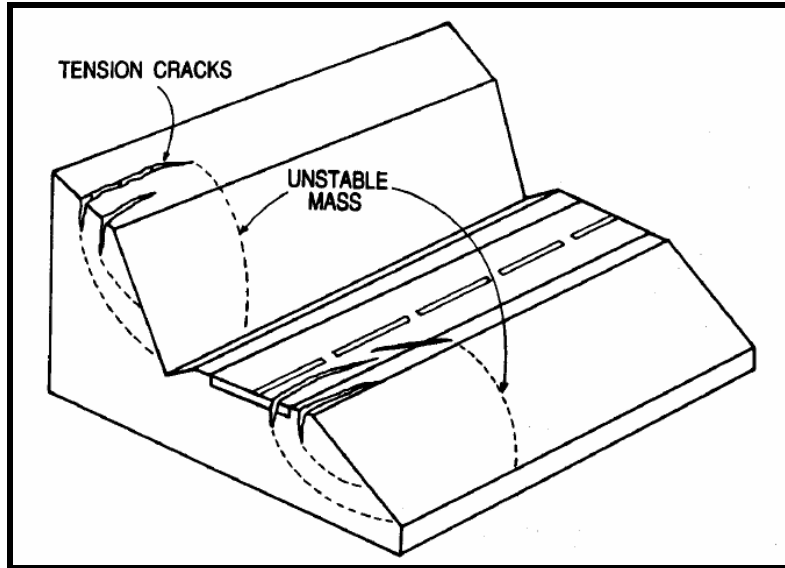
Development of tension cracks at top of roadway or cut slope (FHWA, 1988)
